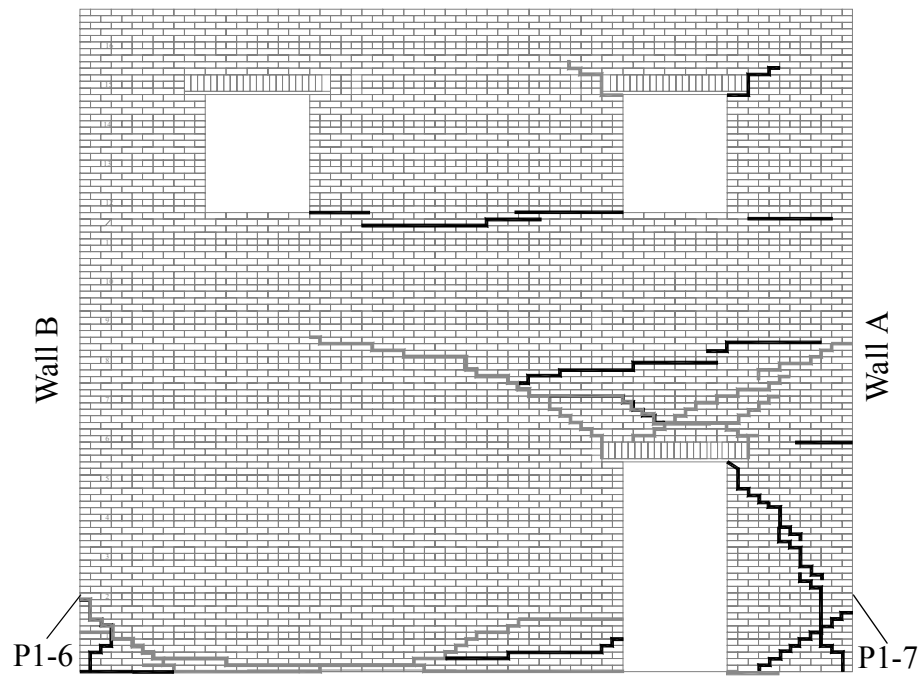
Crack pattern in Wall 1 following Test Run 19.
